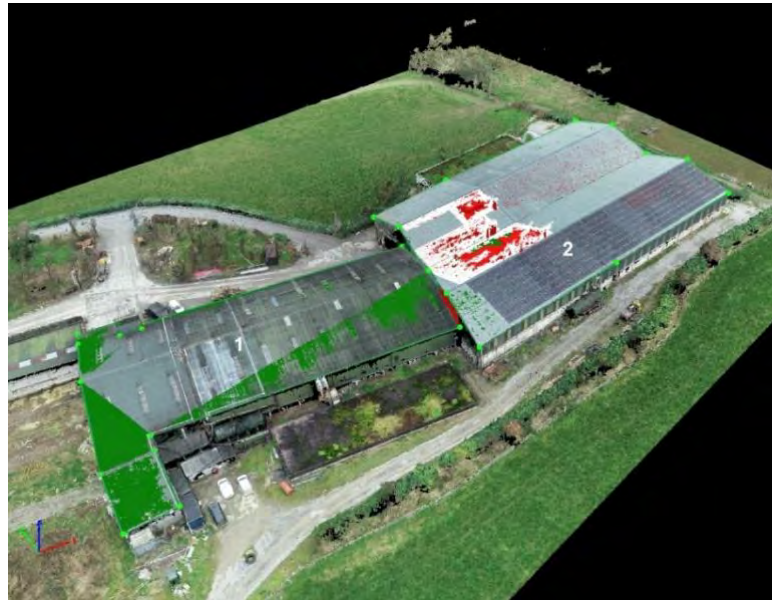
On-site roof structures (Roof 1 to left, Roof 2 to right)
